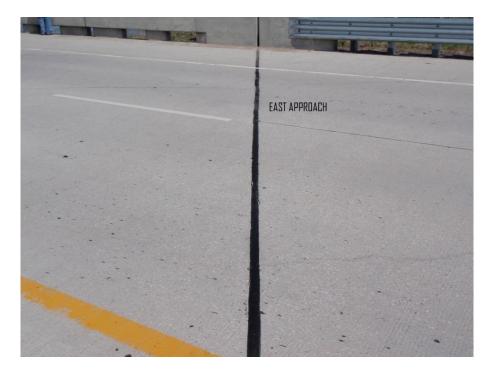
shows the cracking patterns observed in several bridge approach slabs during the routine visual inspections. Structure number and year of inspection are provided below each photo.
